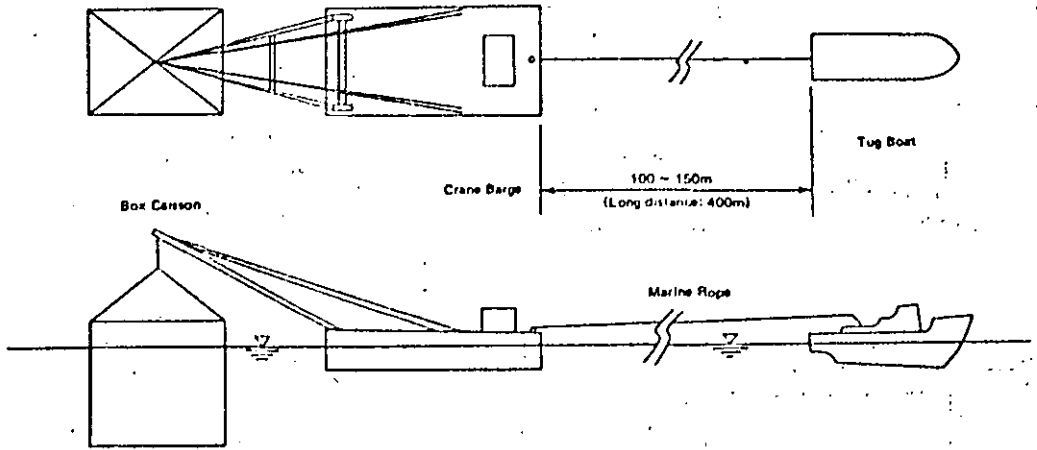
Towing Operation of Box Caisson by Crane Barge Method
